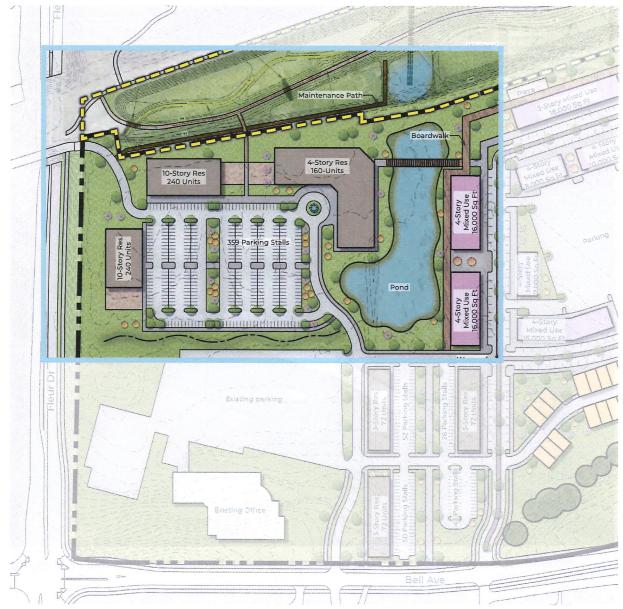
Final South of Gray's Lake Master Plan - Northwestern Corner
